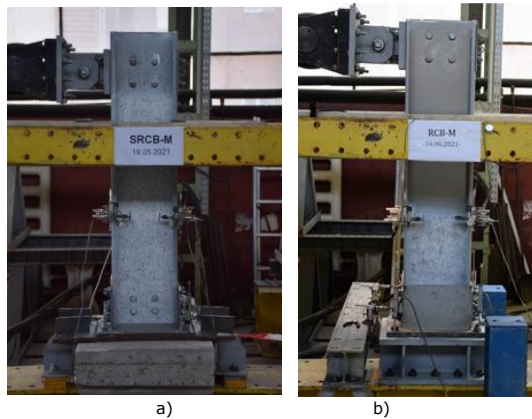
Column-base assemblies: a) with concrete base, b) with steel base.
